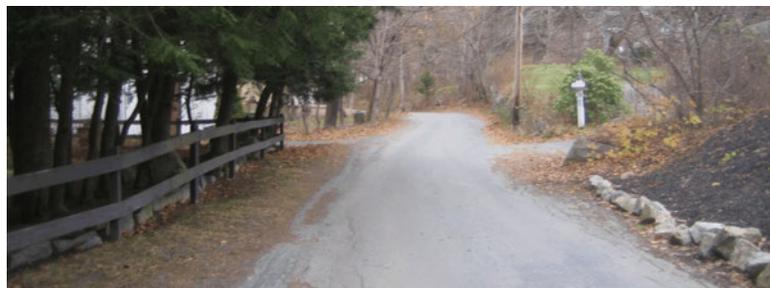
Looking north on Kirk Road towards the McManus Road intersection from the frontage area of Lots 1, 2, and 3 of the as-of-right schemes (Figures 2 and 3) and the Finntigh Lane intersection of the Bare Land Condo Scheme (Figure 4).
